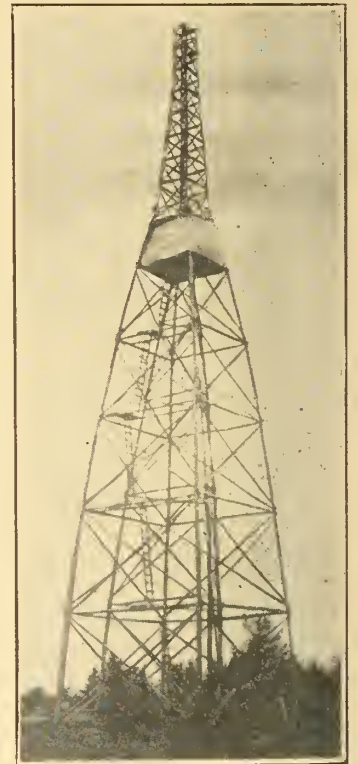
70-foot Triangulation Tower in New Brunswick with 35-foot Extension for the Lamp Stand.
